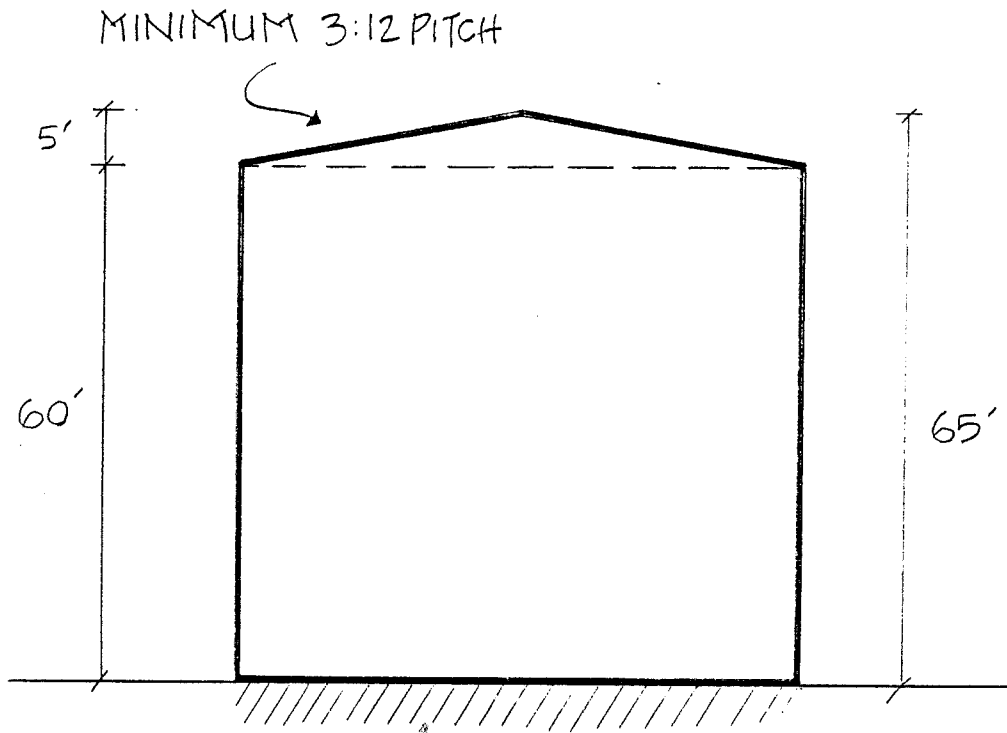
MIDRISE, PITCHED ROOF
